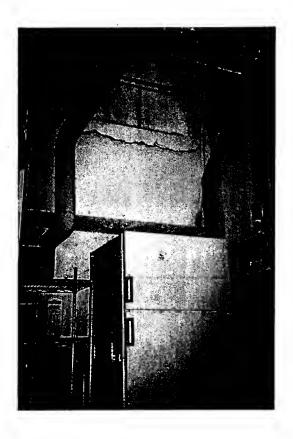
View of north wall of storage/kitchen area below west bleacher. Note crack below window. Photo dated March 2005 by ARG.
